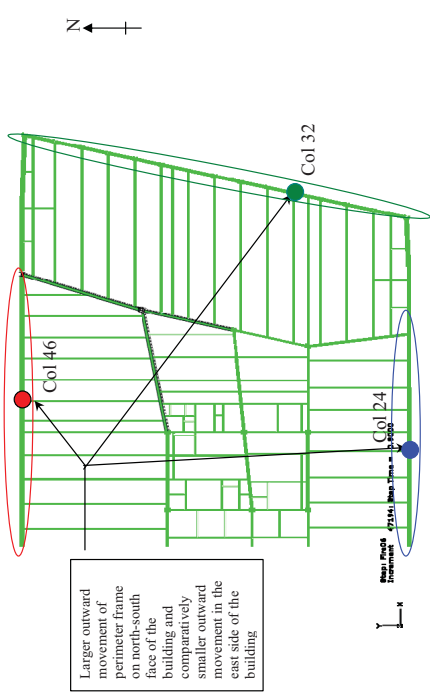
Structural Layout at Ambient highlighting column locations for Figure 19
